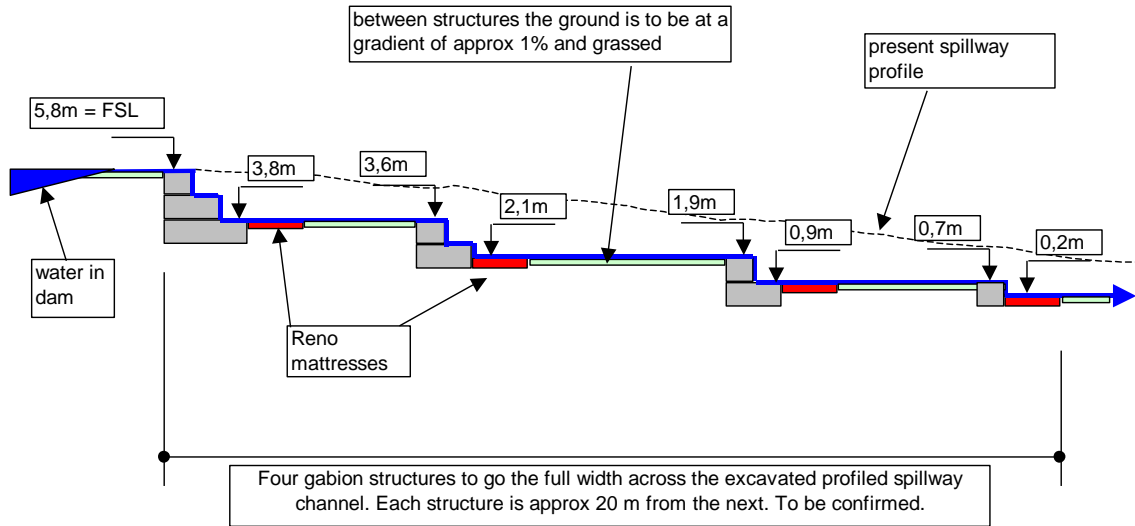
(a) - Section through longitudinal profile of weir-spillway showing where the various changes in elevation are likely to occur. Background structures are not shown.
